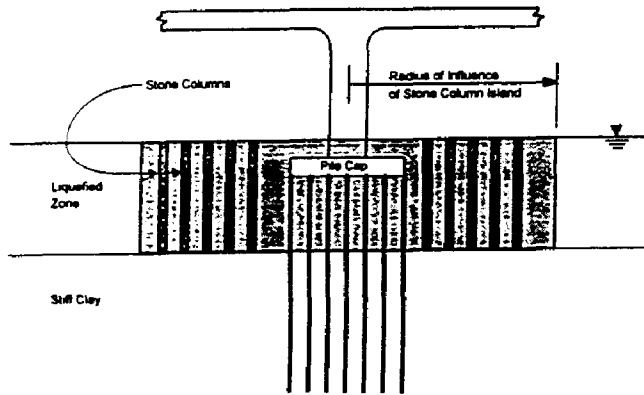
Schematic Illustrating Stone Column Island Providing Substructure Support in the Liquefied Zone
